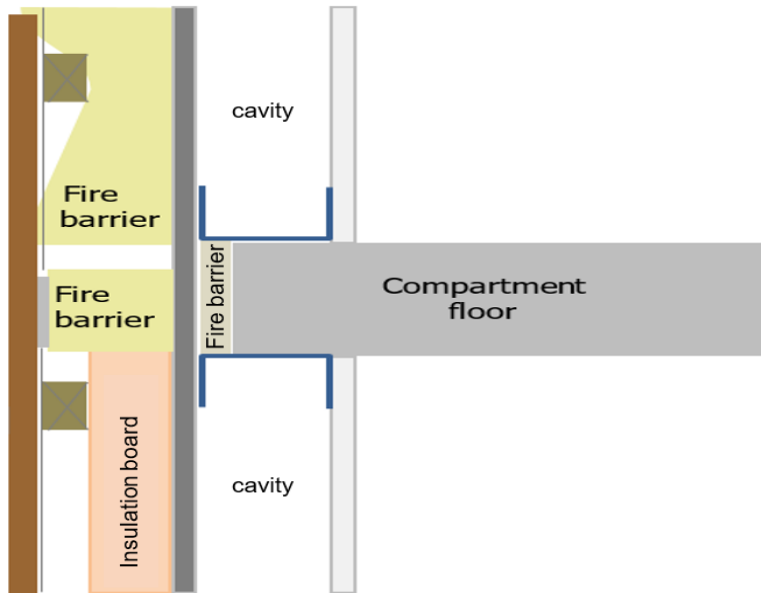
Horizontal and vertical fire barrier junction in a timber cladding system (sectional view)
